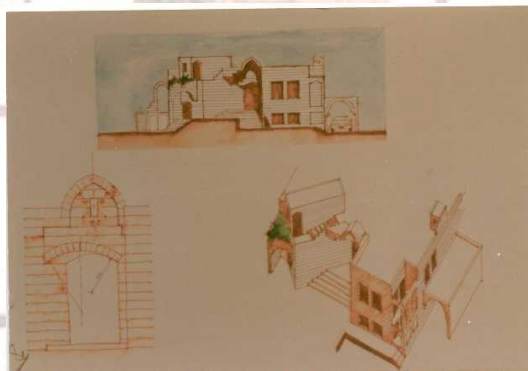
Villa Kalaldehy, Front Elevation showing main and secondary entrances.
